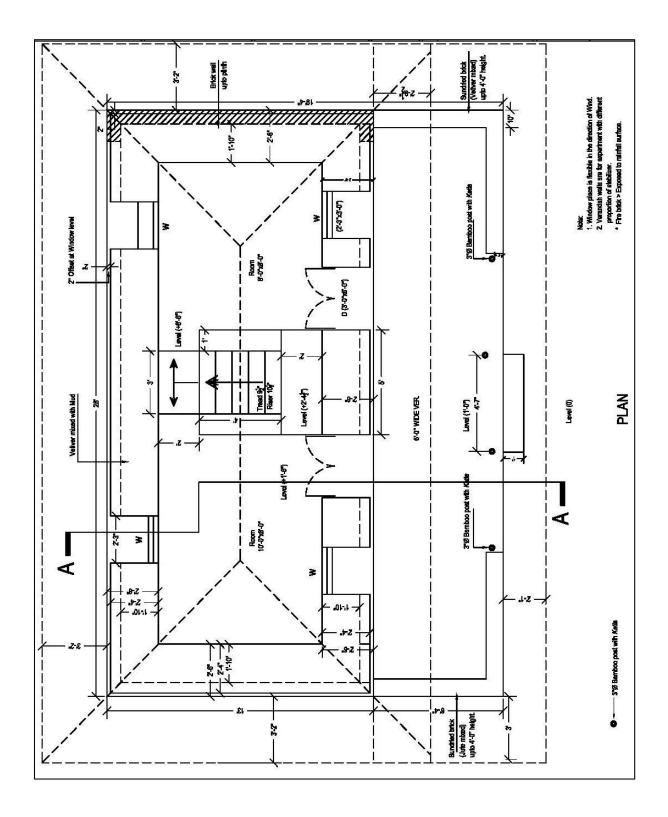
Plan of the constructed improved mud house in Porsha, Noagaon
